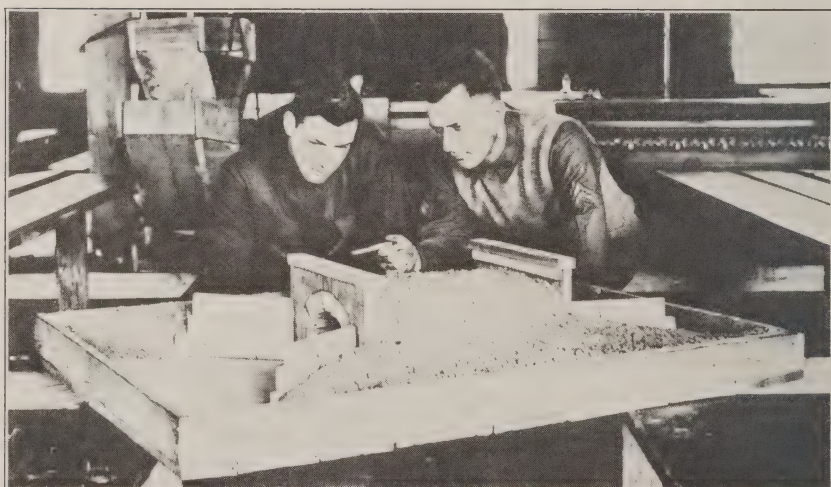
Arch culvert built of wooden blocks in a sand box.
